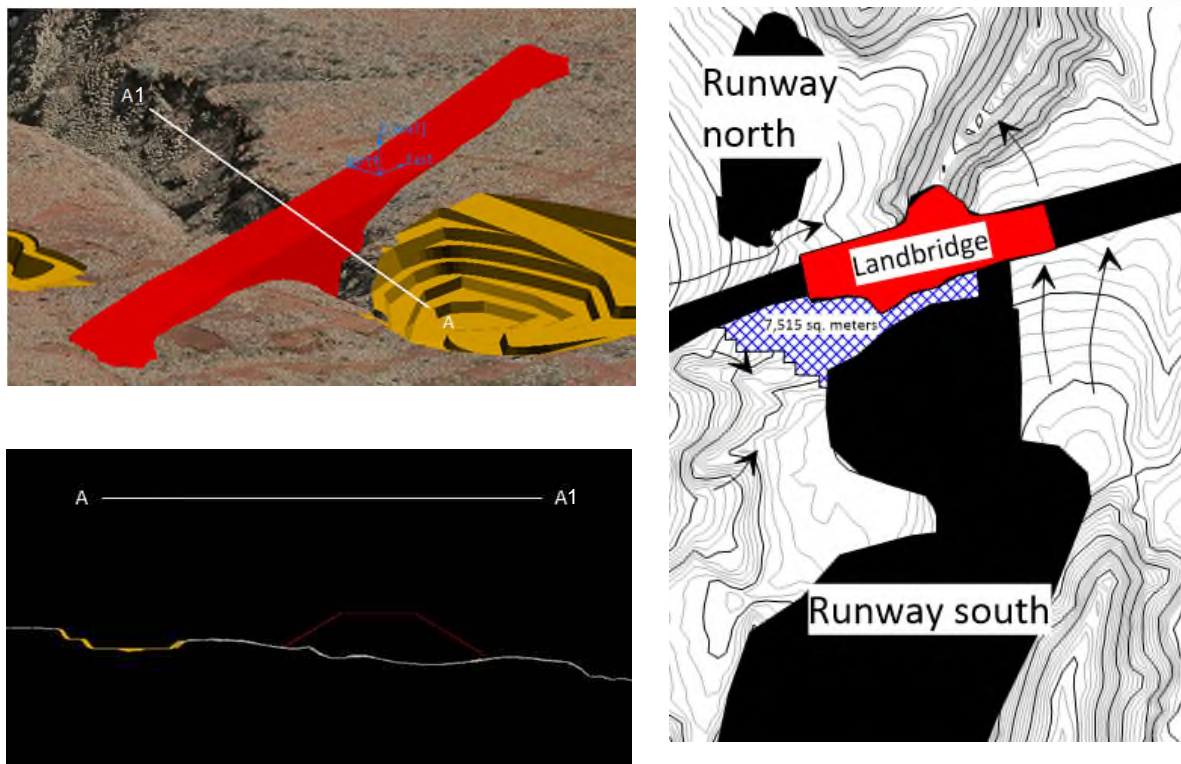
Plan View and Cross-Section of the Land Bridge
